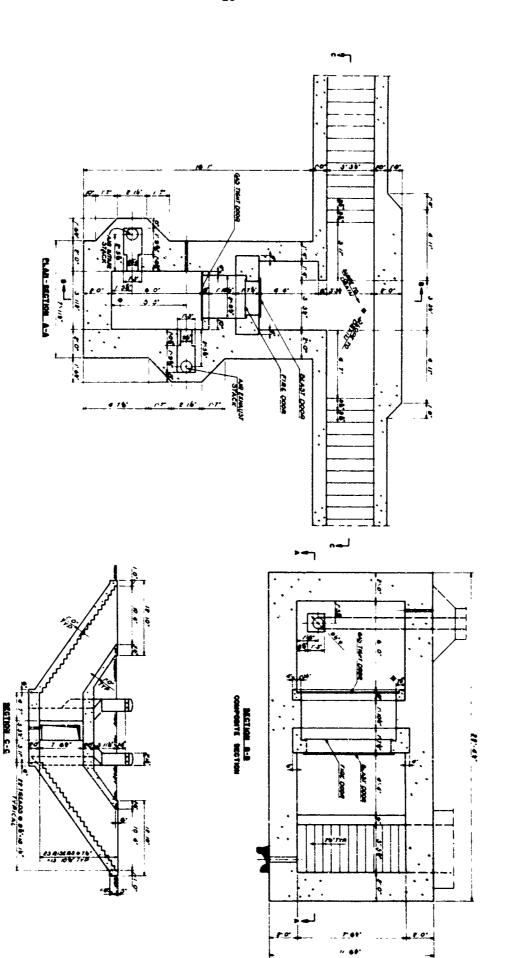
Entrance and entrance chamber, structure II-3, architectural layout.
